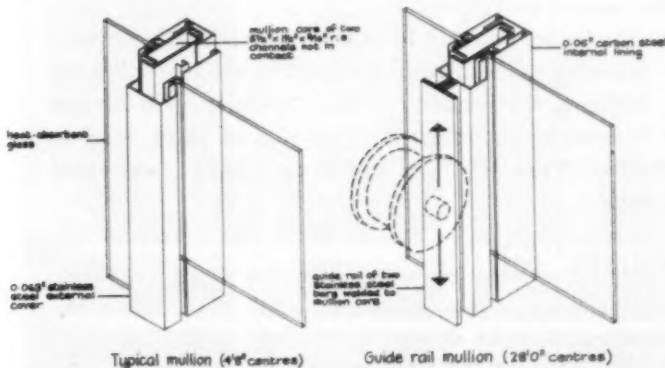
Vertical cradle rails, Lever Building, New York (Skidmore, Owings & Merrill).
